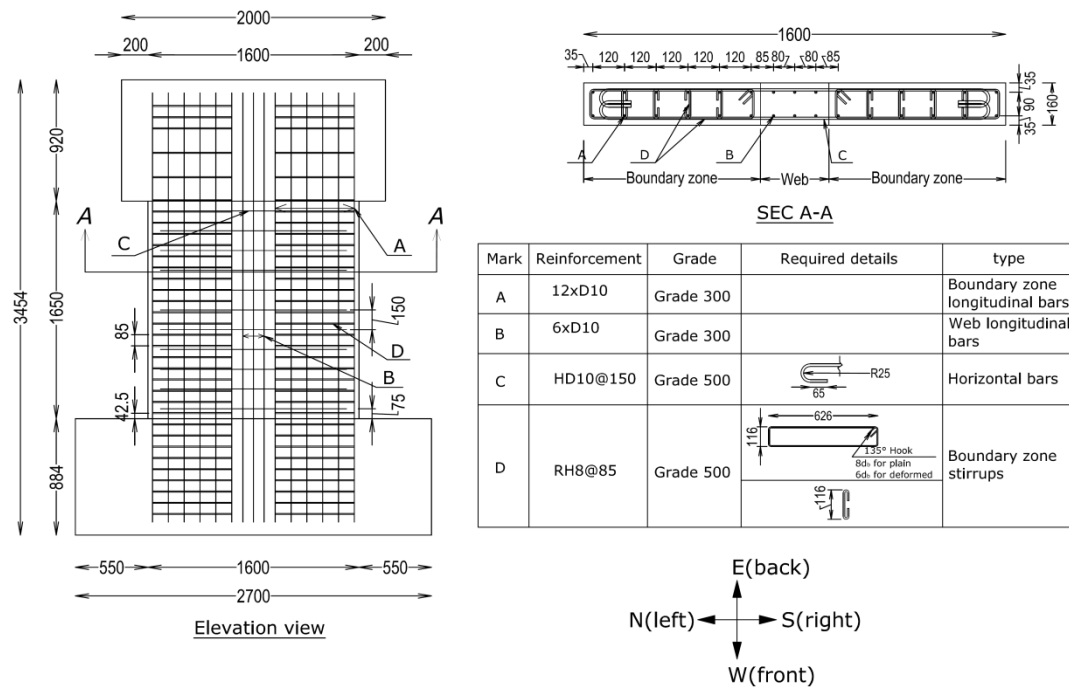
Details of the reinforcement layouts of SP3-LD
